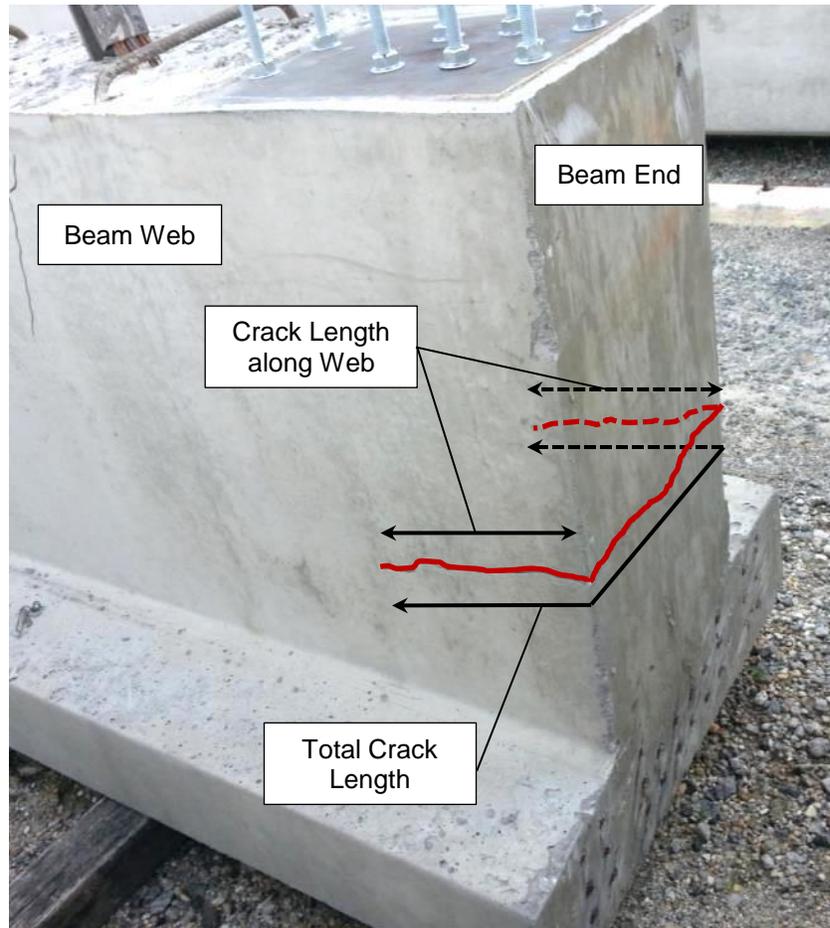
Typical web-splitting cracking (specimen CT2) with terms used in the discussion
